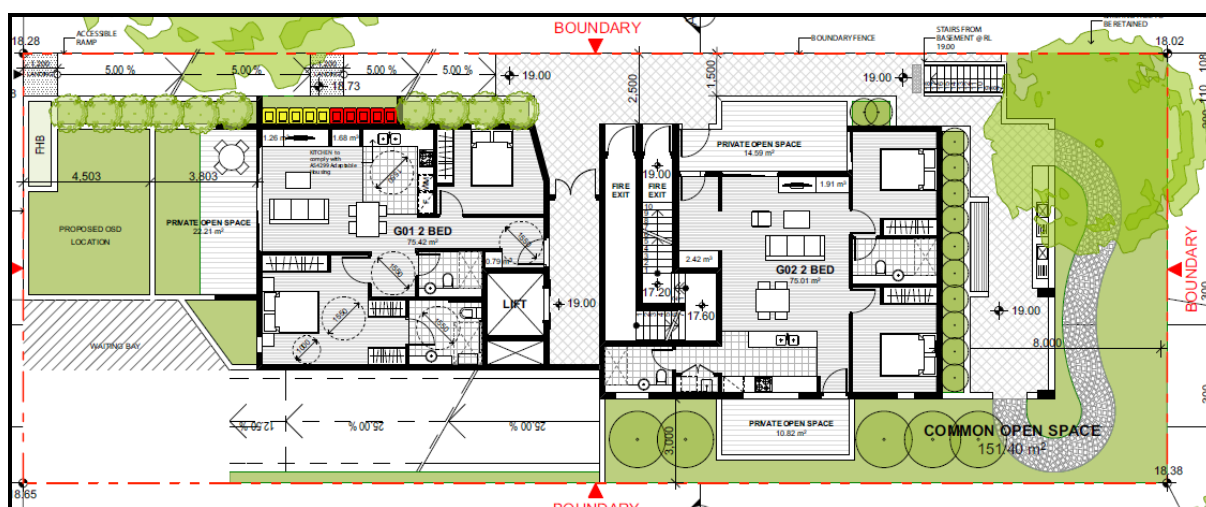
186 Moore Street ground floor plan (proposal RFB to the east)
